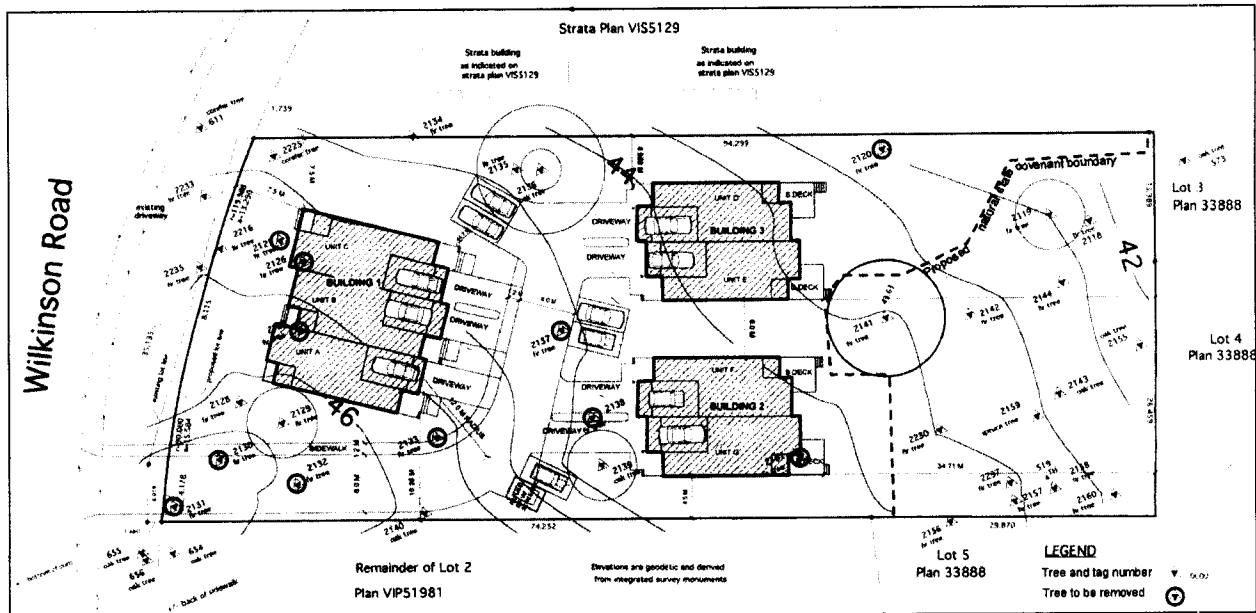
Site plan (based on plans prepared by Hartmann's Drafting & Design)
